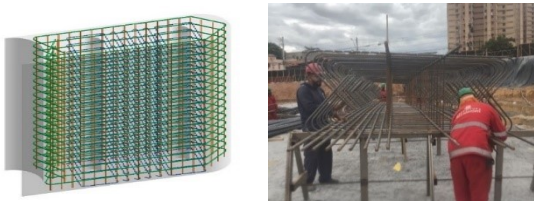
Modeling the reinforcements' panels and assembling them on-site.
